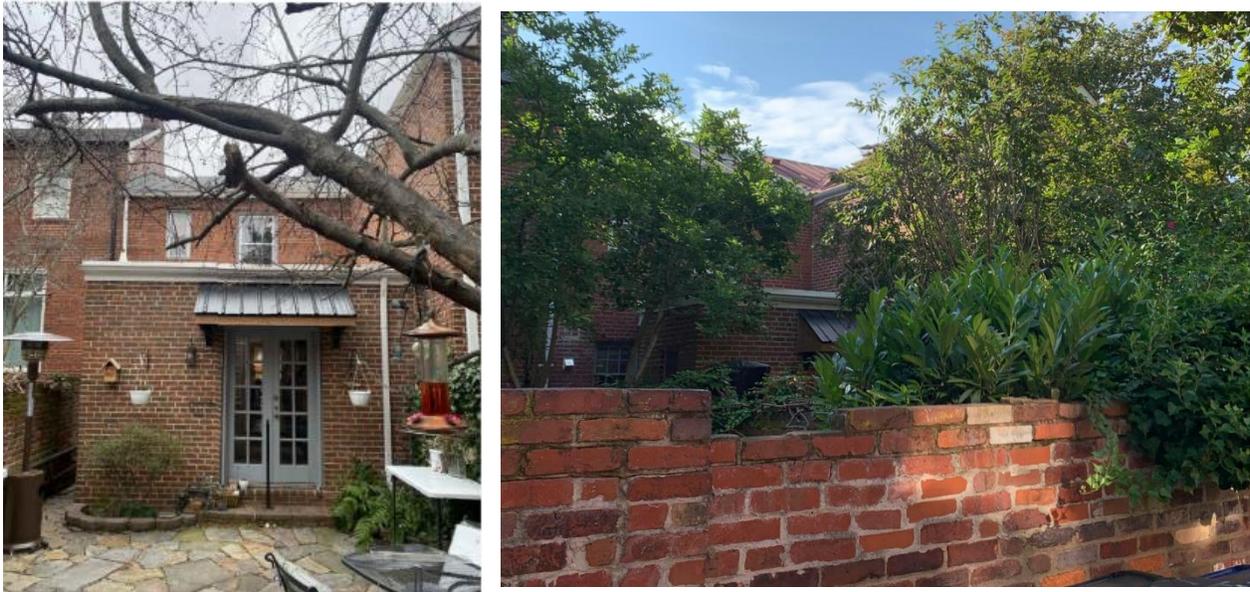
Existing one-story rear addition viewed from backyard (left) and public alley (right).
